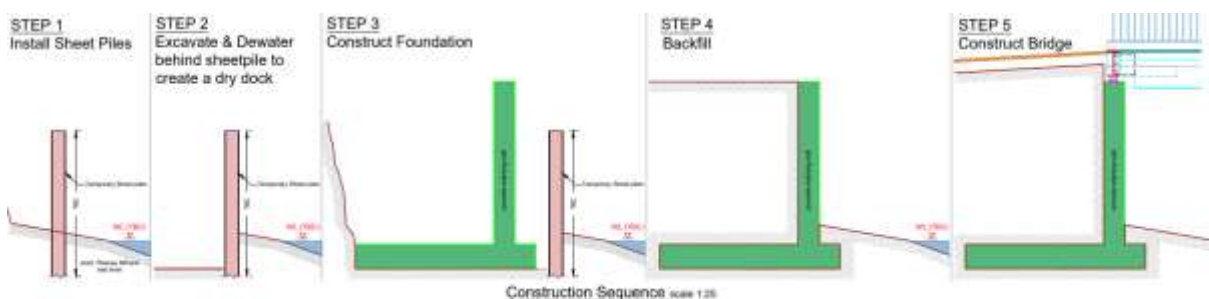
Construction sequence for abutment structures to support the steel deck of Bridge 5 (refer to drawing RHA-XX-DR-S-SP0052)
